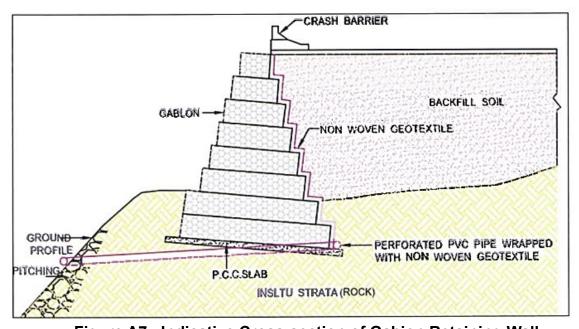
Indicative Cross-section of Gabion Retaining Wall
